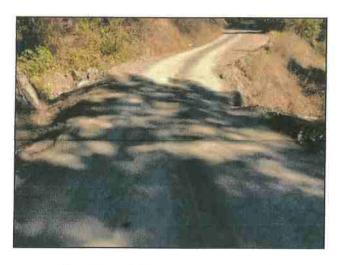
River Rd Looking @ Culvert Location In Photos 126 & 125 Erosion Area
